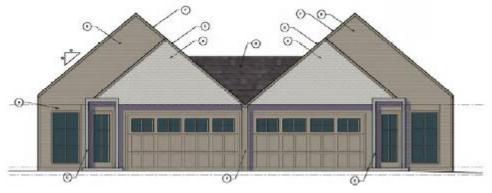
Street elevation (Sundance Dr., Units 1-20)
